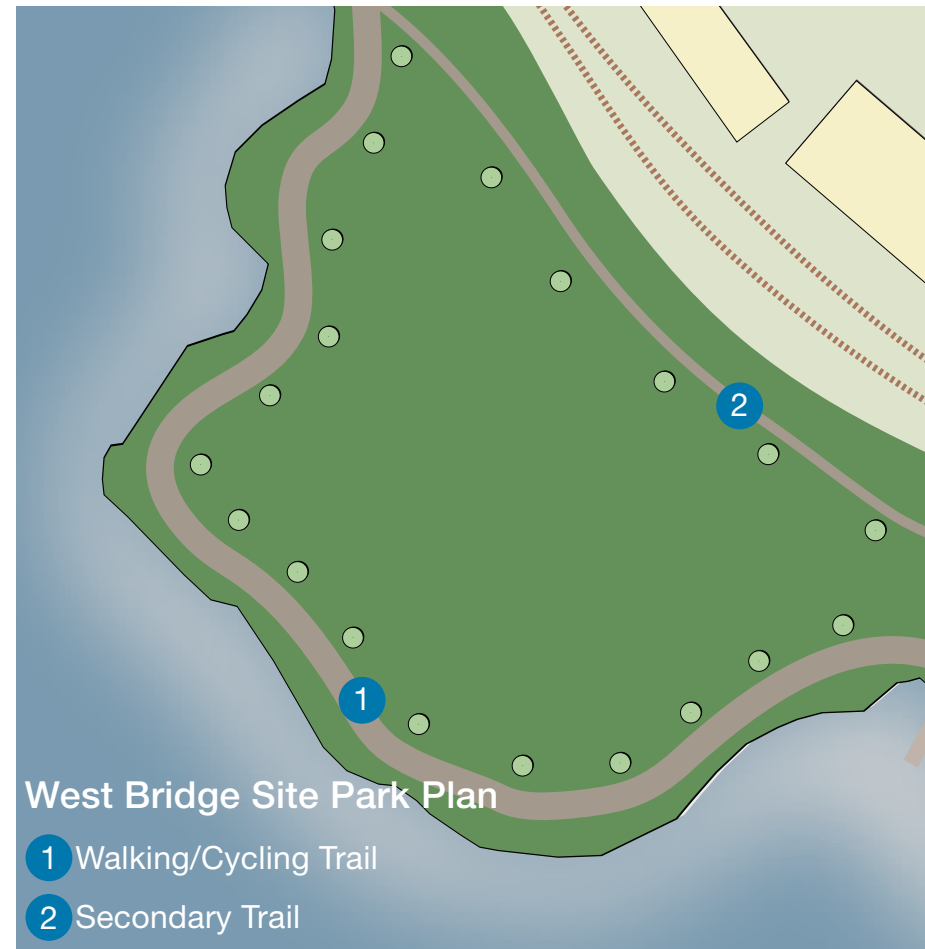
Proposed schematic for Bridge Expansion site (Phase 3)
